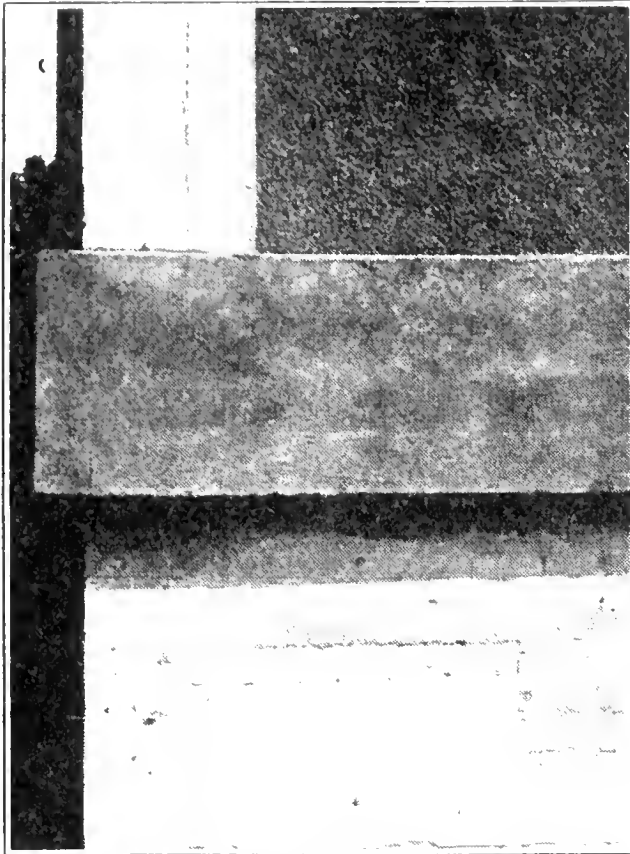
Showing the spatter-coat finish on upper wall, carpet-covered float finish on water table, and the surface of lower wall and columns as left by the forms
